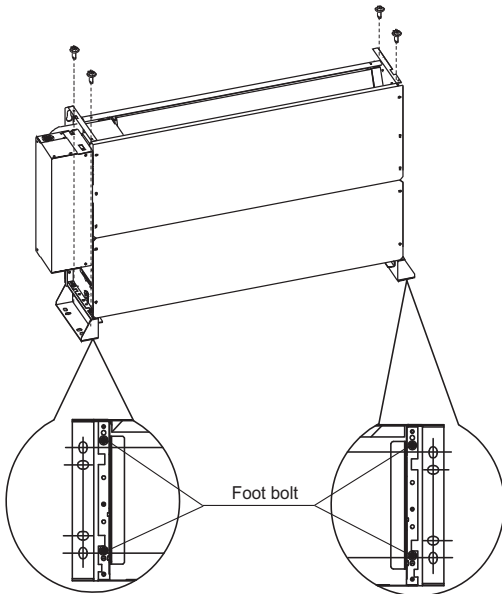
Installing Mounting Feet and Mounting to Floor
